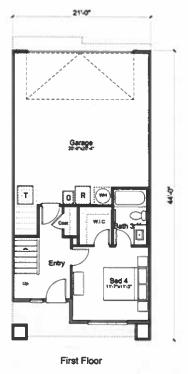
Conceptual Architecture - Plan 5 Floor Plans
